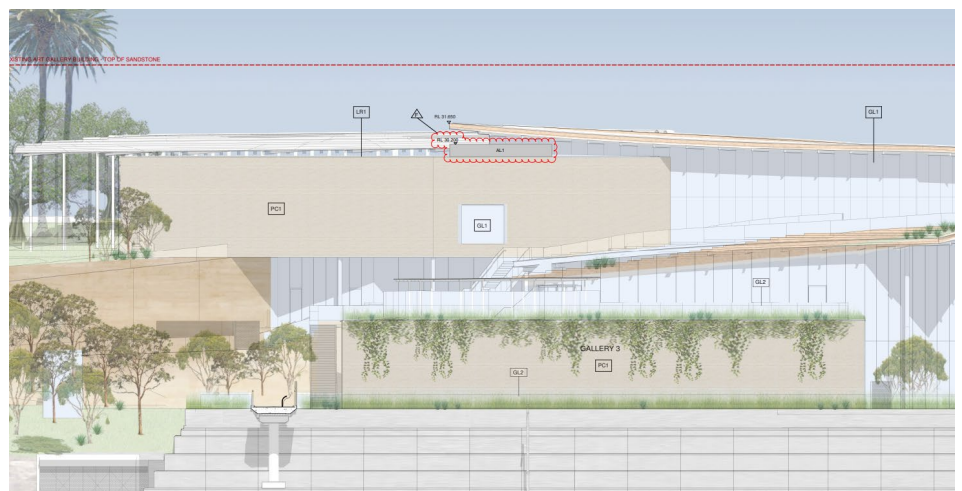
Proposed East Elevation A – Drawing no. DA_3013
